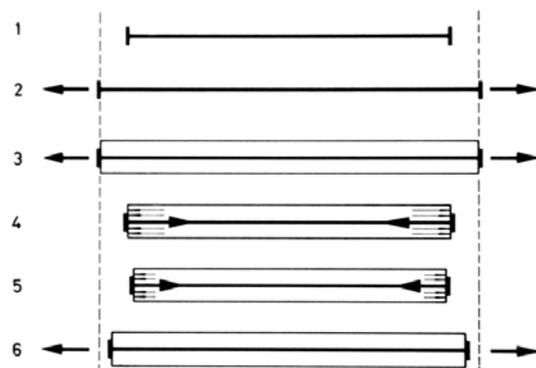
Schematic showing principle of prestress transfer to the concrete. (Möll)
